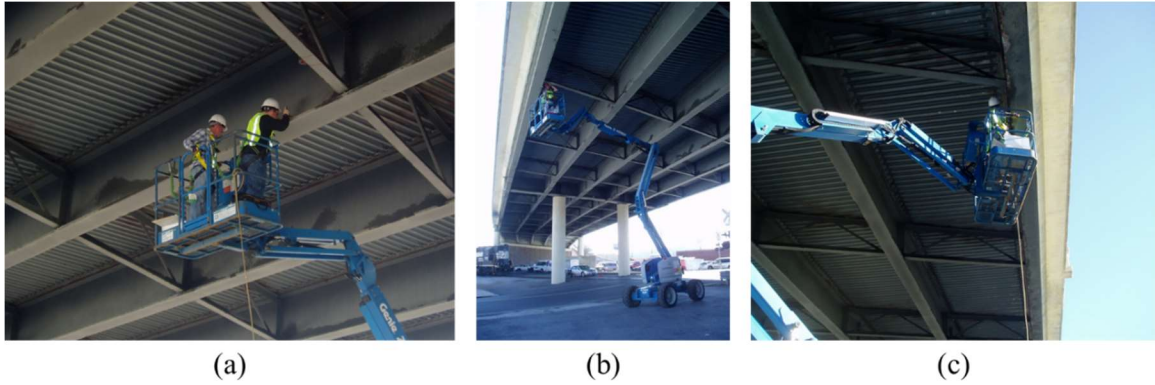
Installation Photos: a) Strain Gage on Interior Girder, b) Strain Gage on East Exterior Girder and c) Strain Gage on West Exterior Girder
